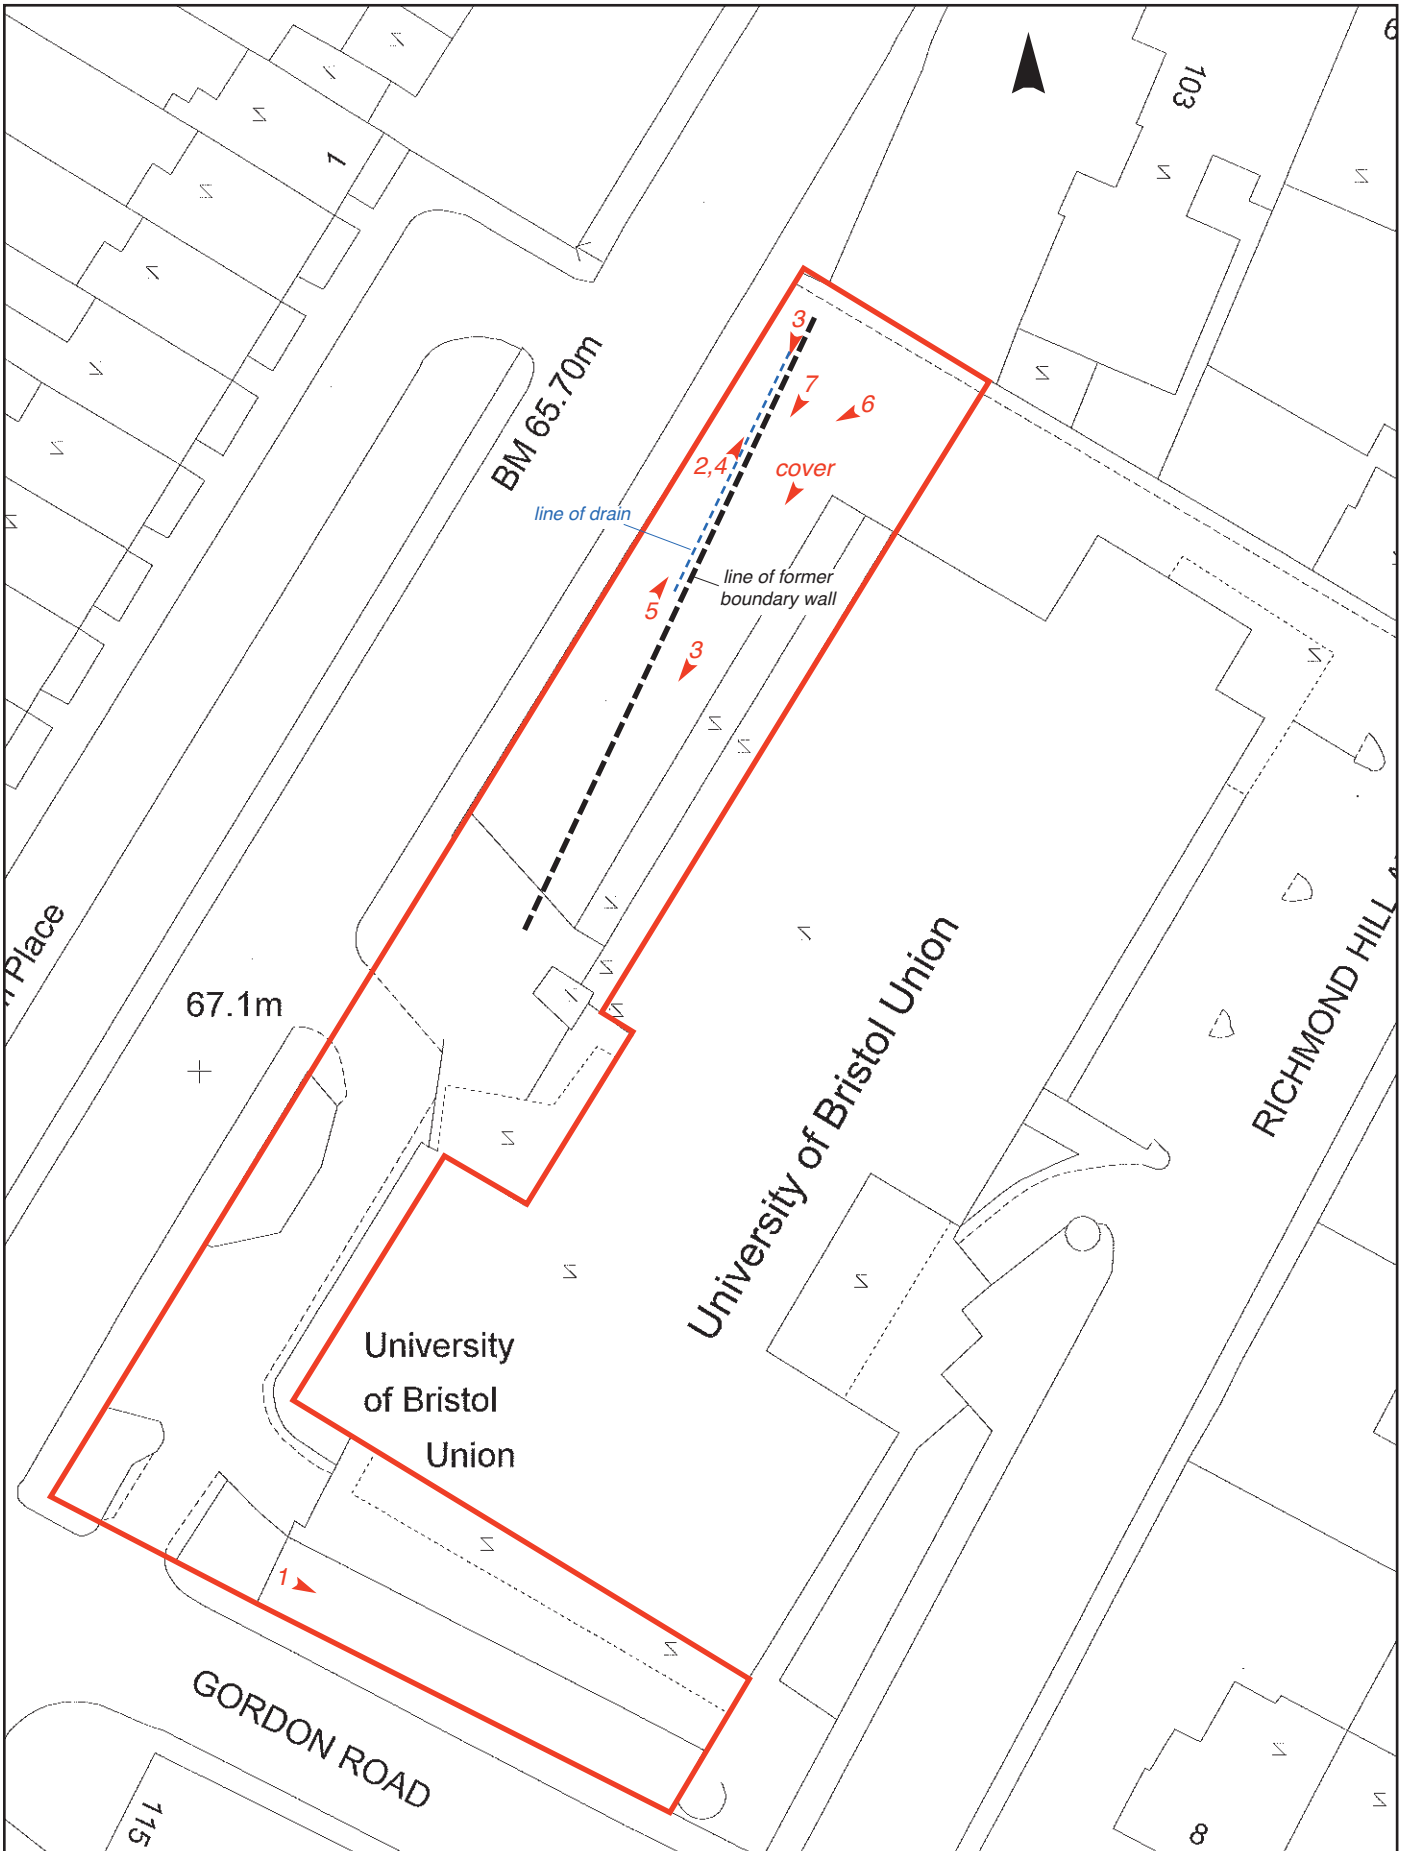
Site plan (1:500 scale), showing location of 19th-century boundary wall and drain
